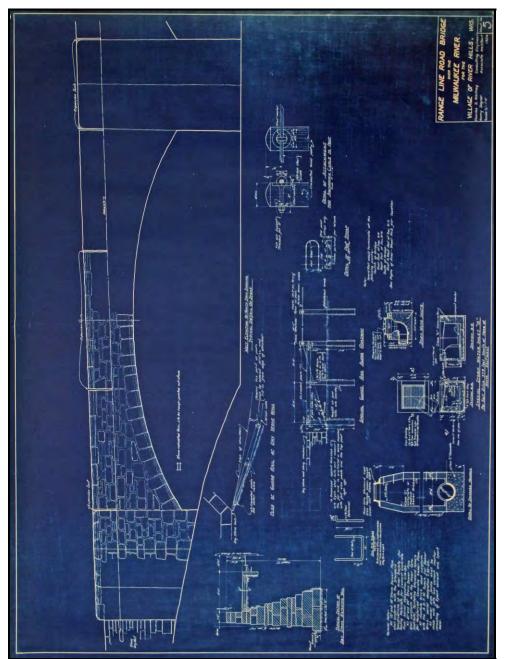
Range Line Road Bridge Plans, Sheet 5, 1934 (On file at Village Hall).
